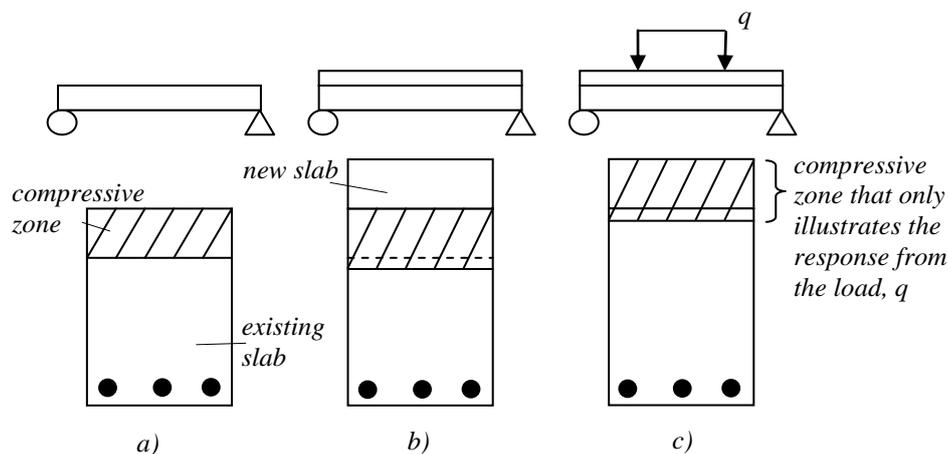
Schematical illustration of a joint between existing concrete and new concrete, a) existing concrete, b) existing concrete with new not hardened concrete, c) existing concrete with hardened new concrete.
